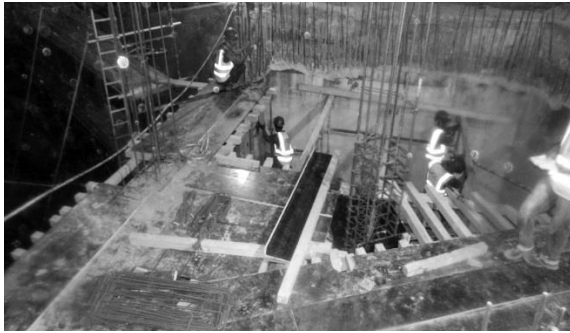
The shuttering work for columns and slab of seawater intake structure
